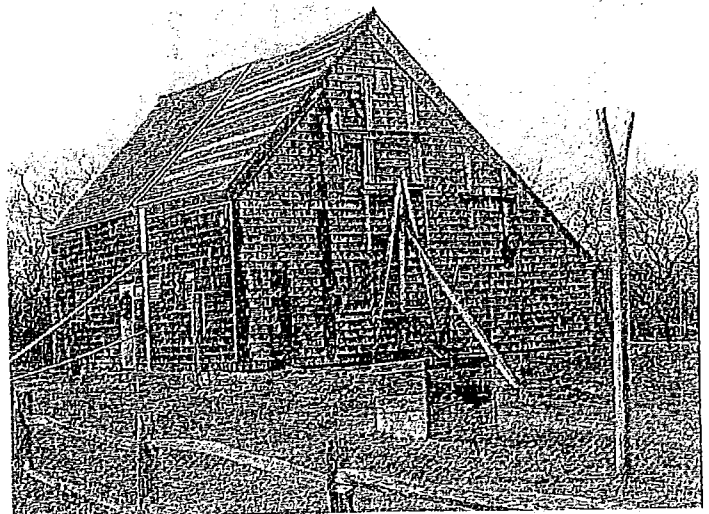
Buildings seriously damaged by storms or deterioration may need to be braced before architectural evaluations can be made. Jethro Coffin House. Photo: John Milner Architects.
